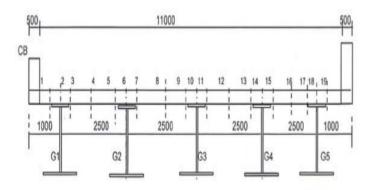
CROSS SECTION OF BRIDGE LAYOUT
